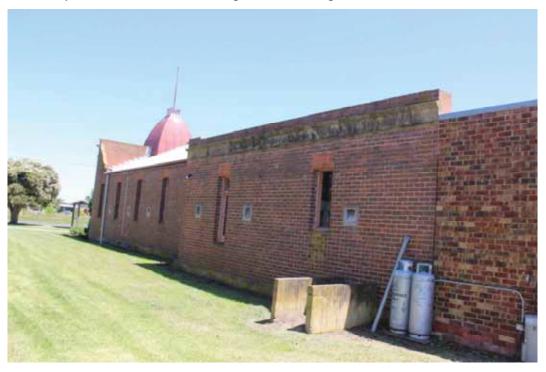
The south elevation showing the rear of the parapet which continues onto the side elevations. The windows have the same treatment as those on the facade. The rear section of the 1904 building has a parapet with a band of roughcast render.
